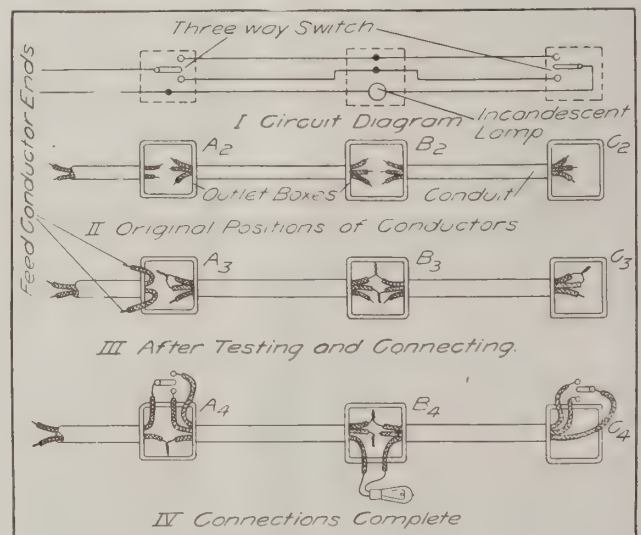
TESTING OUT THREE-WAY SWITCH CONNECTIONS.
